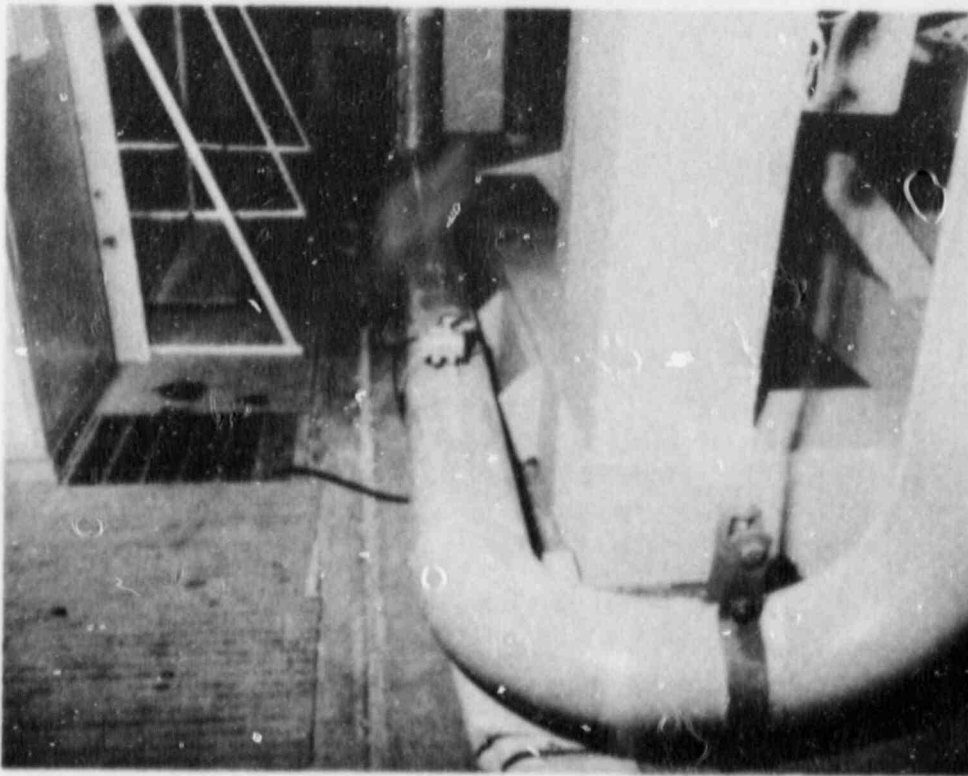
Bent horizontal section of inside piping for 8-in. gate valve test.
